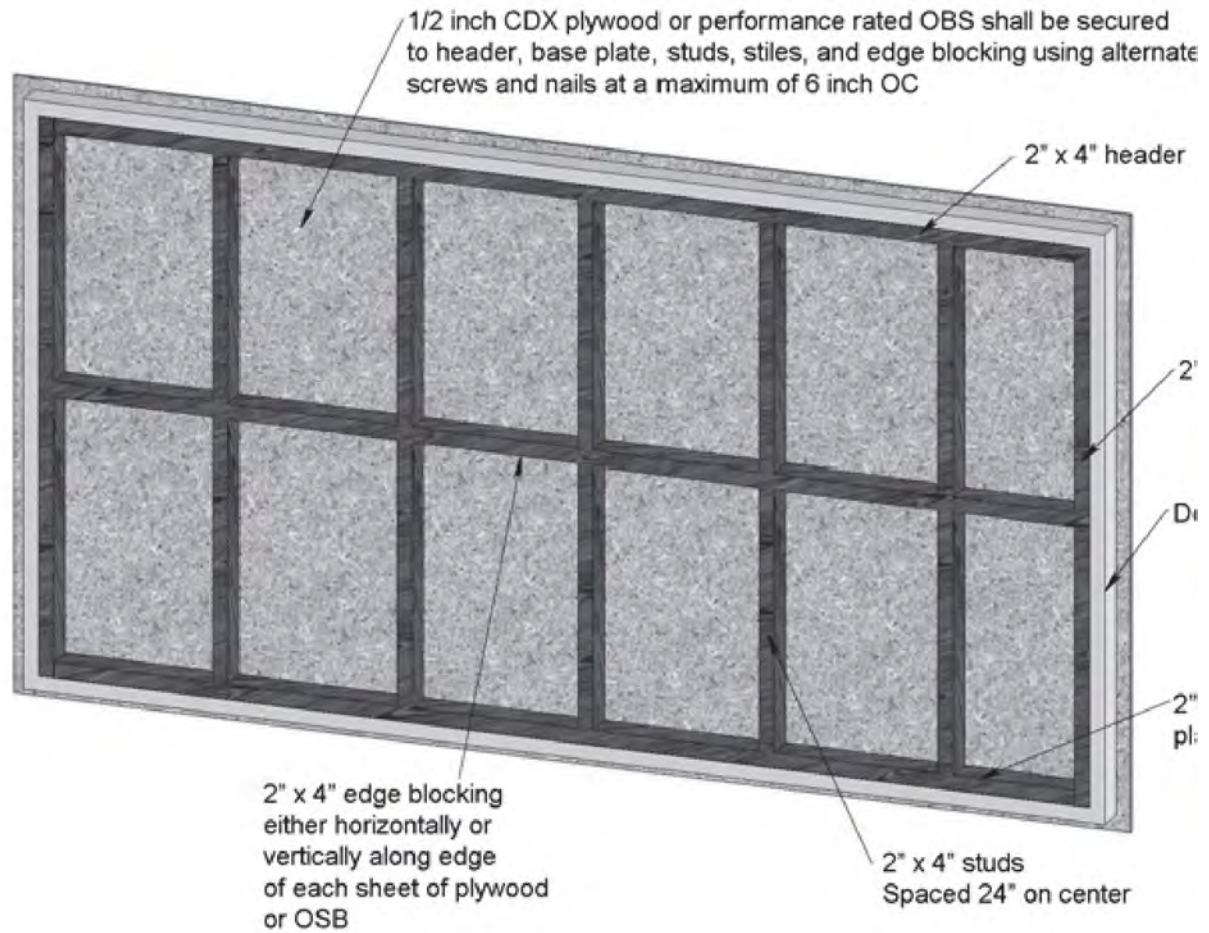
(2) BOARDING OF DOOR WALL
